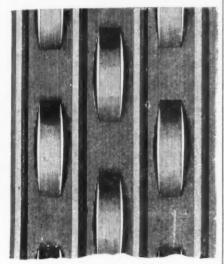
General View of the Bostwick Metal Lath, with the Loop Projecting to the Front.
